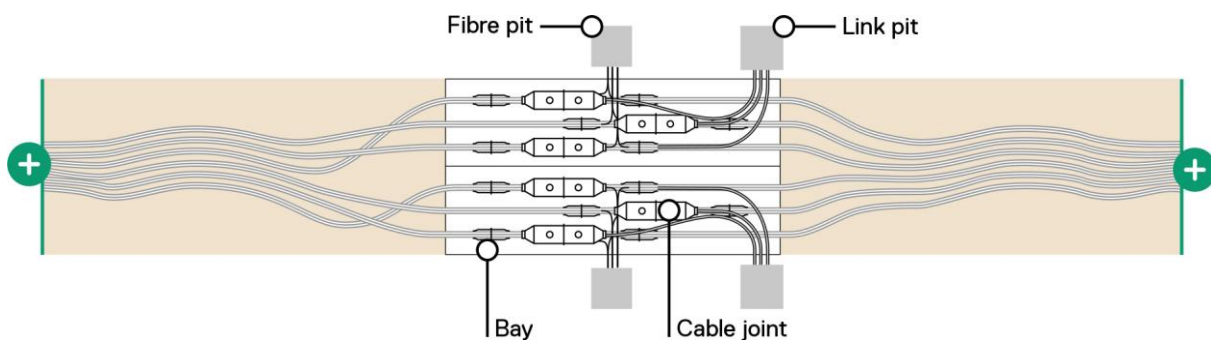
Joint bay locations within the underground cable system (five circuits shown)
